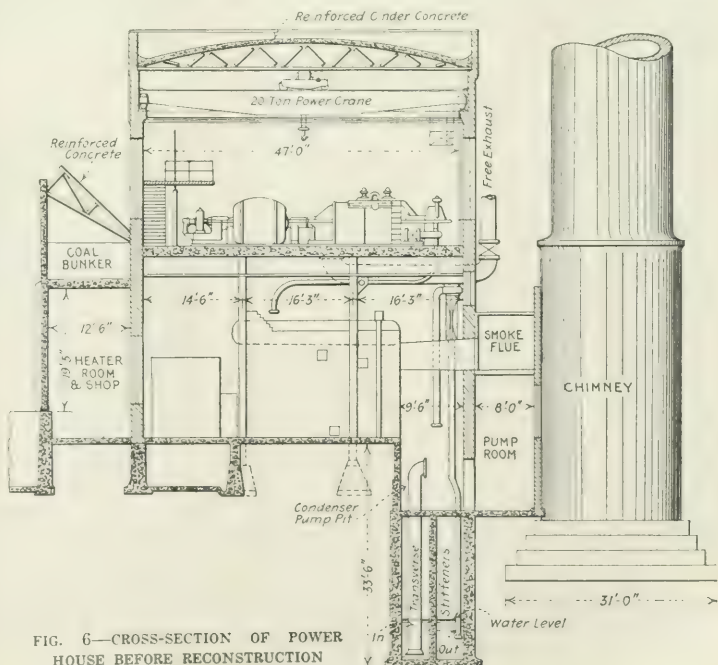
CROSS-SECTION OF POWER HOUSE BEFORE RECONSTRUCTION
